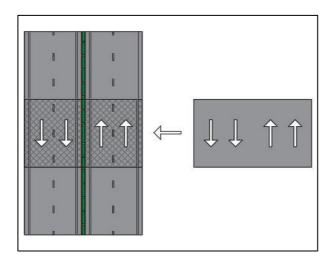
Bridge deck horizontally jacked of transported into position.
